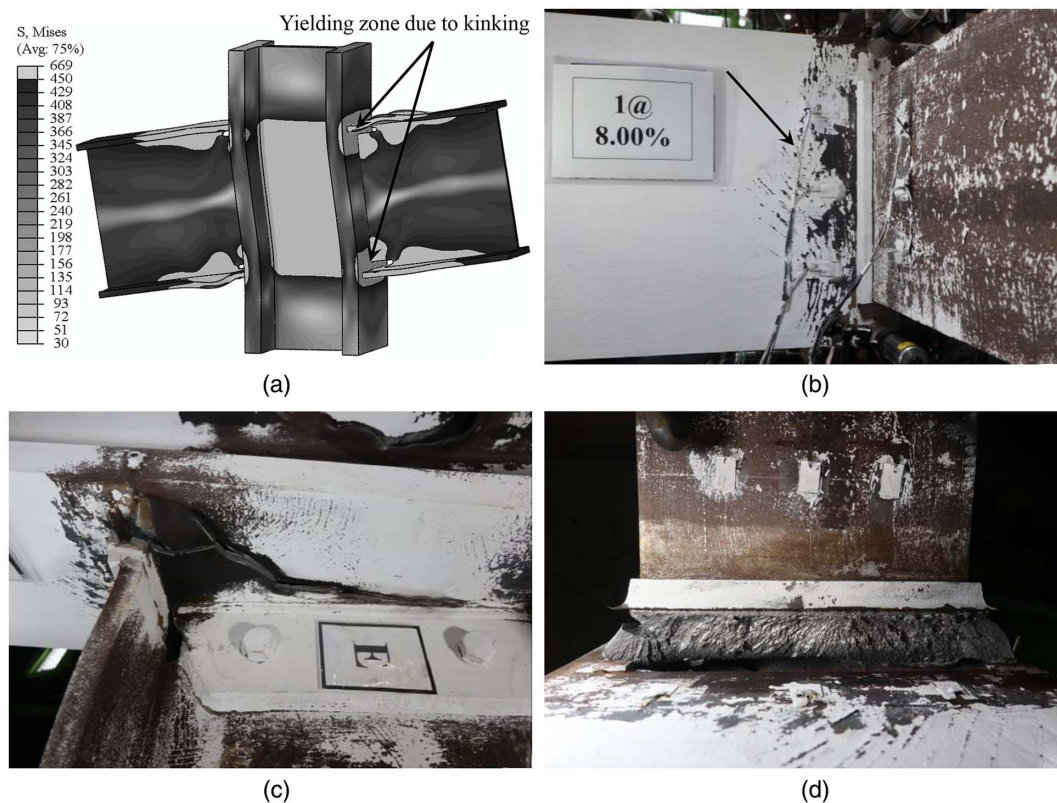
Kinking at the east beam bottom flange of Specimen 1: (a) illustration through finite element modeling; (b) localized yielding due to kinking at 8% rad and crack pattern due to kinking at 9% rad; (c) side view; and (d) bottom beam flange view.
